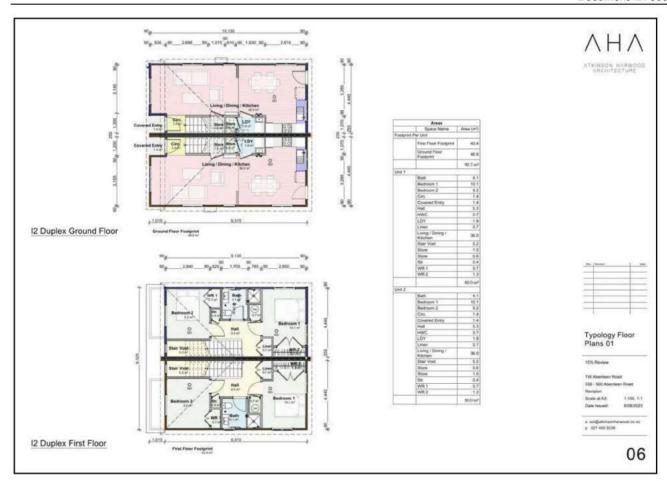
(From top to bottom): Floor plans for proposed duplex building across Lot 11 and 12, alongside the architect's drawing (Lot 11 and 12 is labelled). Image Source: Client supplied.
